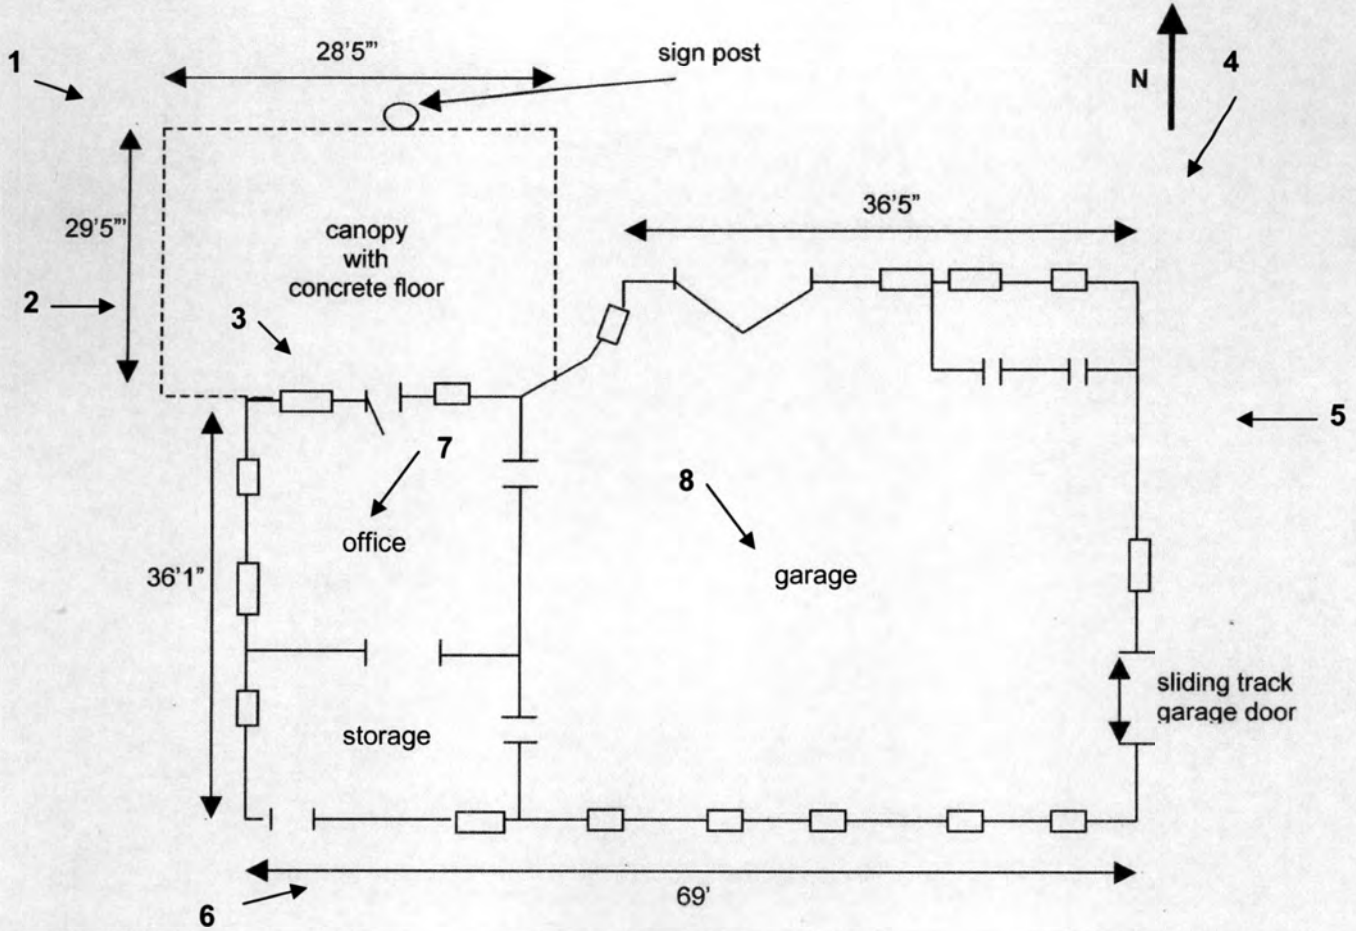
John Osterman Gas Station Floor Plan with Photo Key (not to scale).
